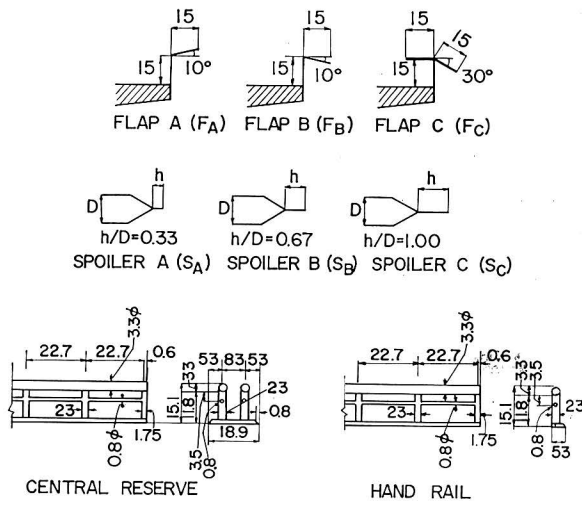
Dimensions of Models for Wind Tunnel Tests
